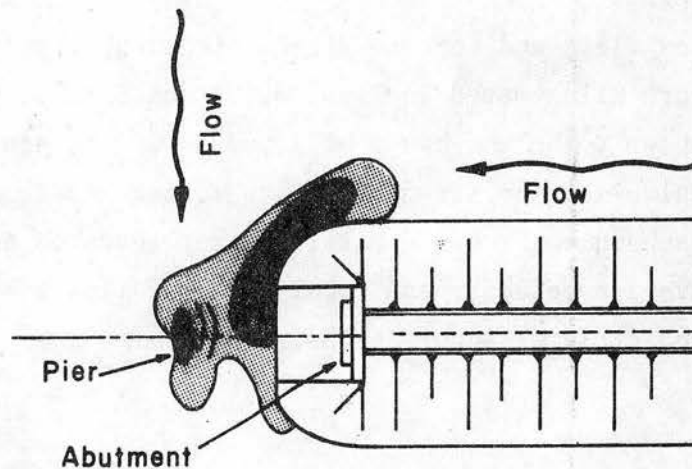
Typical scour at an embankment and adjacent pier.
